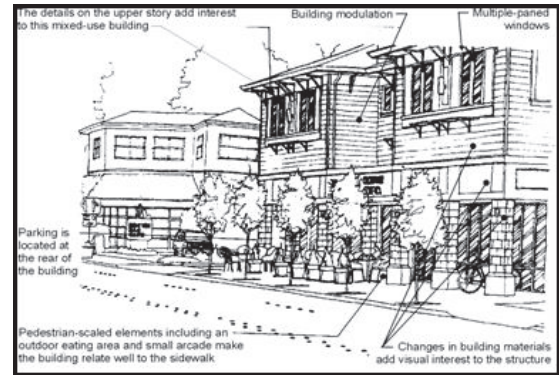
The use of different building materials, window treatments, and roofline brackets add to the visual interest of this building.
